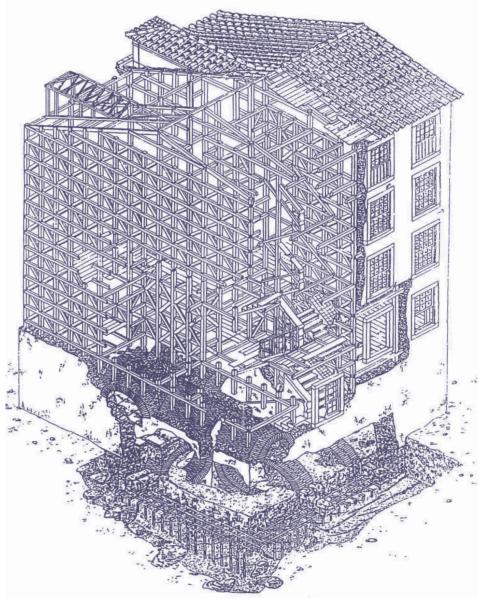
An écorché-style depiction of an original Gaiola Pombalina structural system in its context.
